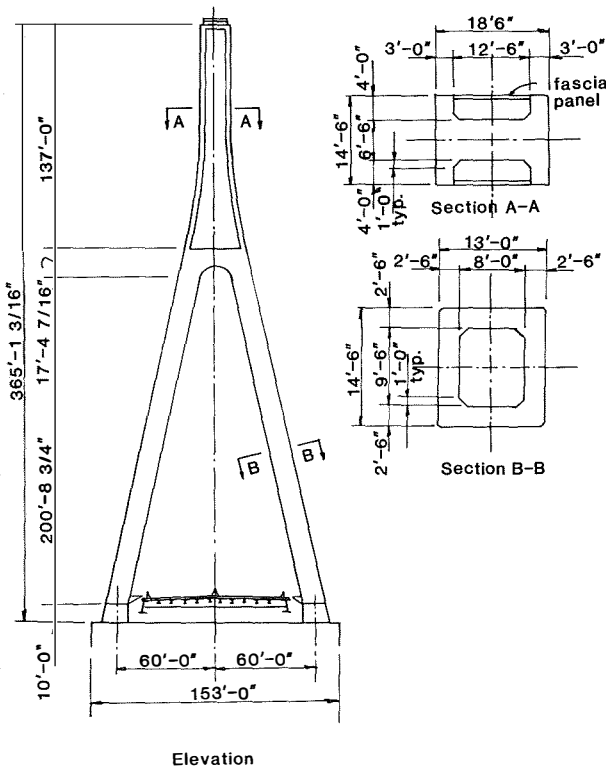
Weirton-Stuebenville Bridge, pylon.
